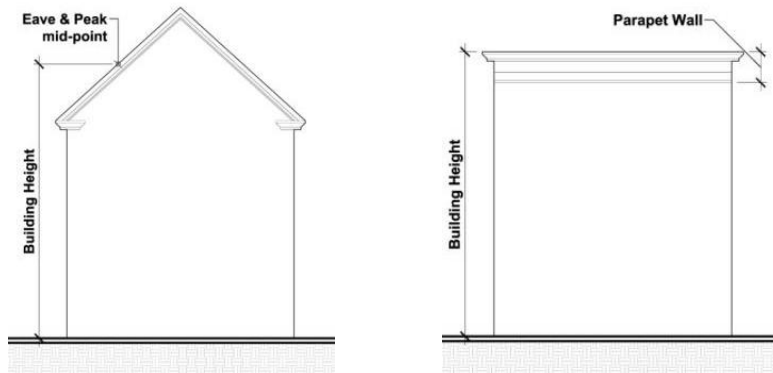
J: Example of building height measurement for a sloped roof (left) and a flat roof (right).
